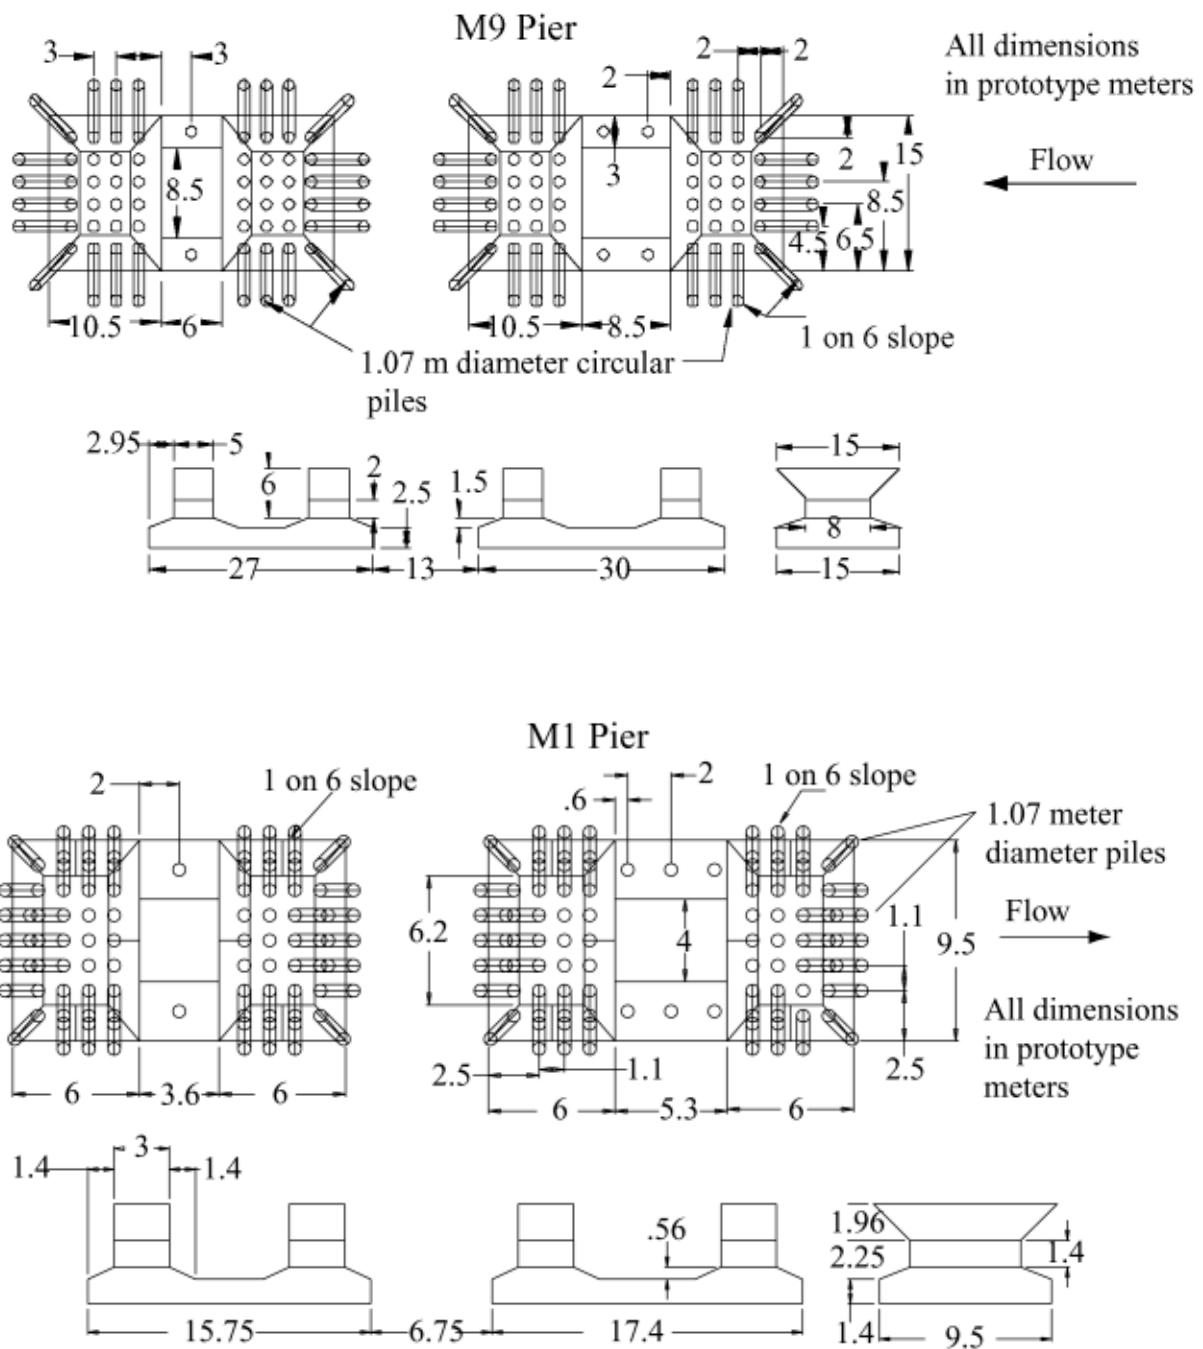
Drawings of two of the proposed piers for the Woodrow Wilson Replacement Bridge. All dimensions are in meters.
